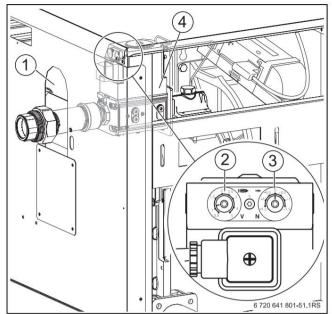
Conversion to a different type of gas (boiler size 200 to 280 kW)
